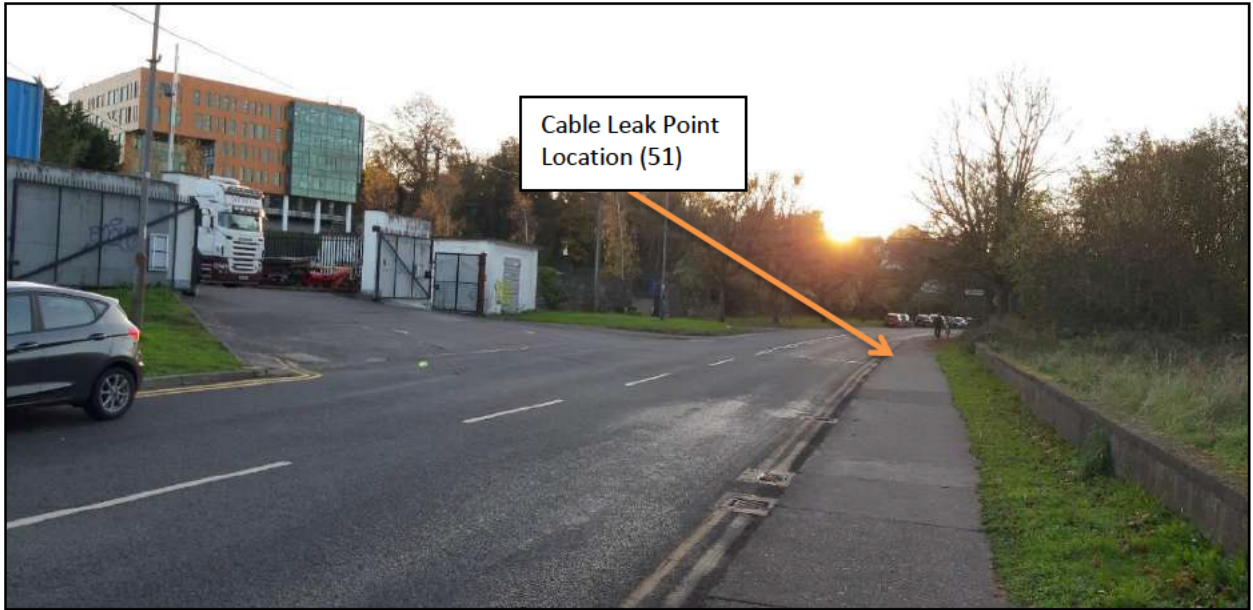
View looking south on Monaghan Road, of entrances to commercial premises. Also note, the ESB substation structure.
